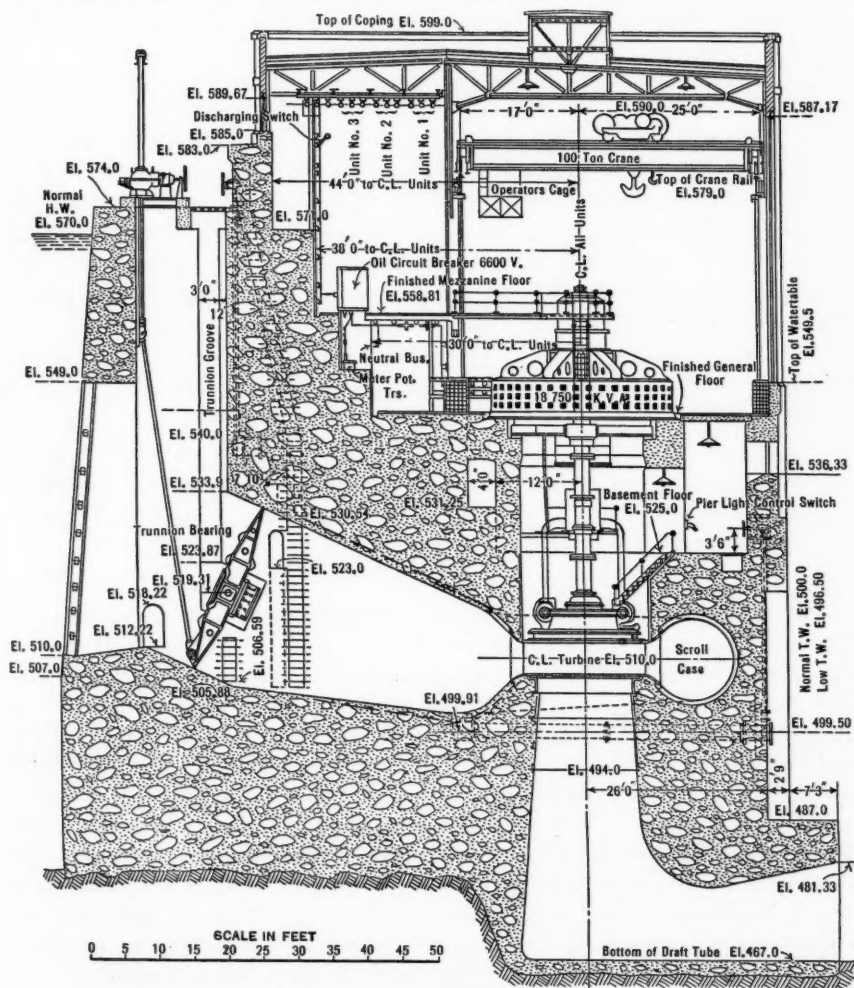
CROSS-SECTION, POWER HOUSE, NEW CATAWBA STATION.
